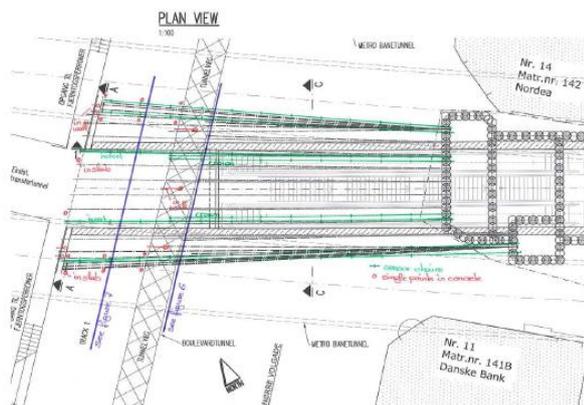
Plan view of the tunnelling/freezing segment with monitoring installations
